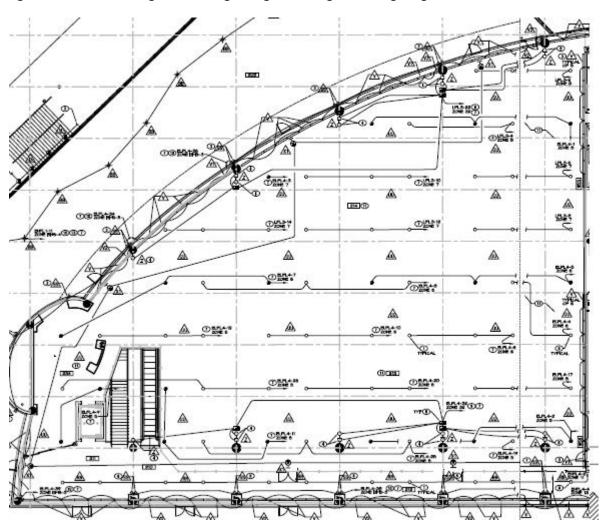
Ticket Queuing and Waiting Lounge/Meeting Rooms Lighting Plan
